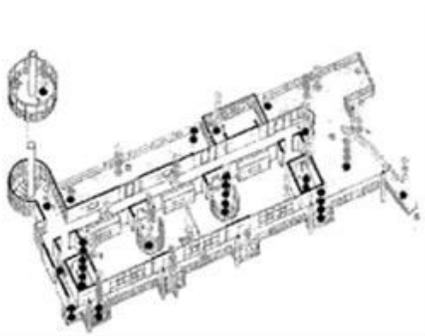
Plan of Frankfurt Sashsnhausen kindergarten
